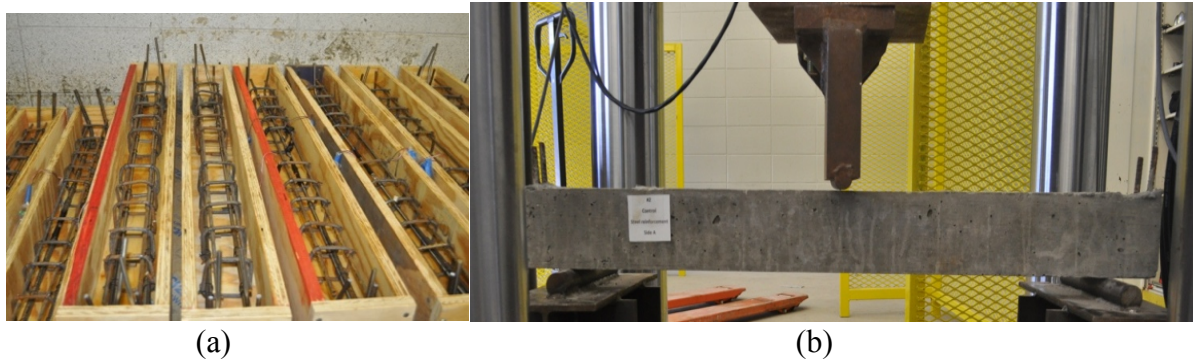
(a) Reinforcement setup in forms and (b) Placement set up under loading
